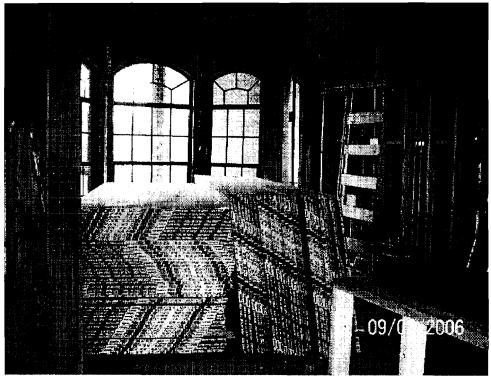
Photo of drywall sheets inside consumer's home.
